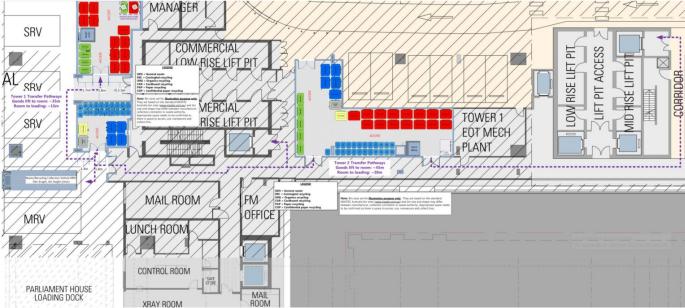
Tower 2 Waste Room Layout & Transfer Pathway (Source: Rawtec)
